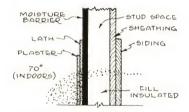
Recommended Placement of Moisture Barriers in New Walls of Remodeled Houses
